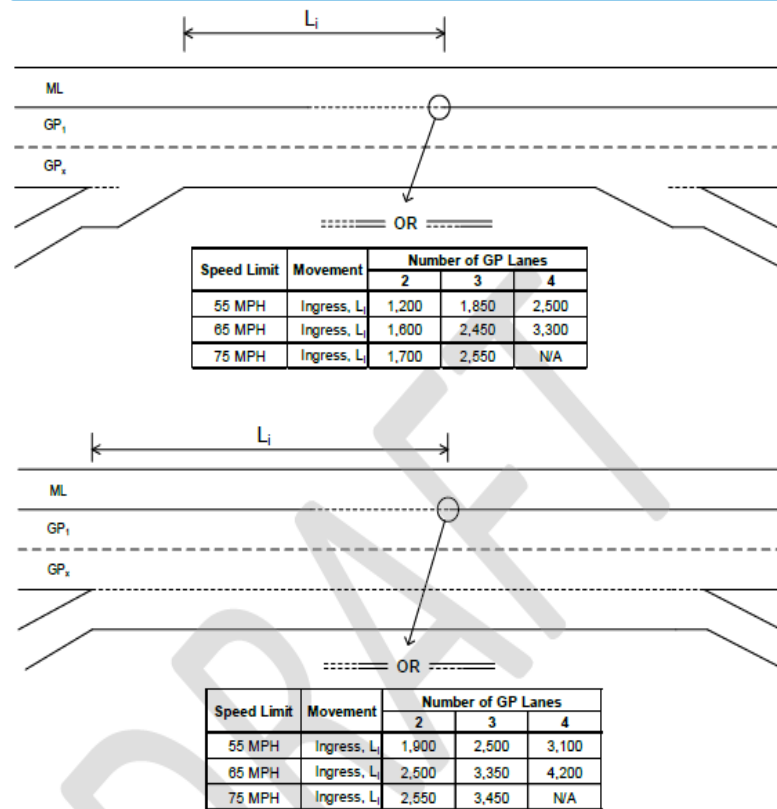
Recommended Minimum Access Zone Spacing from Upstream Ramps
